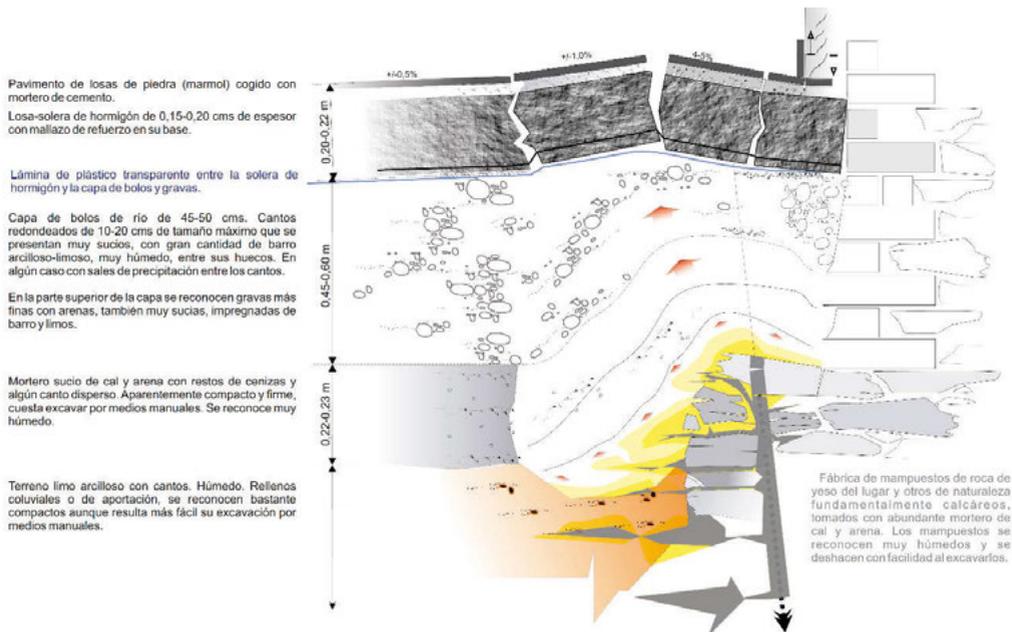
Outlined explanatory diagram of the situation observed during the excavation of pit 2. The figure includes the cement grout injections, which were injected-infiltrated between the gypsum rock masonry of the very foundation of the Church walls. These gypsum rock fragments are sometimes recognized as broken and displaced; enclosed within a grey-whitish mass (in yellow).
